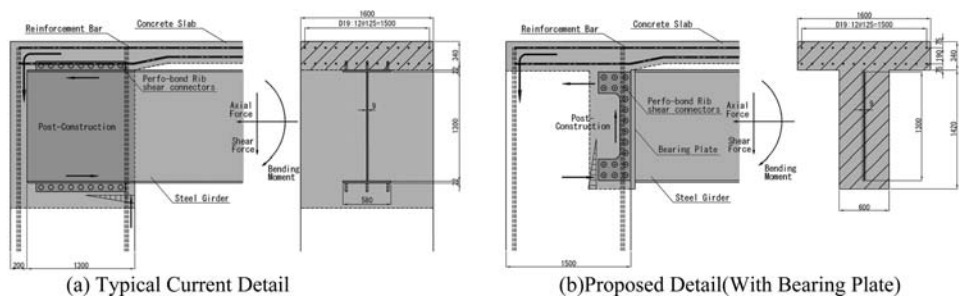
Proposed New Rigid Connection Detail (unit: mm).
